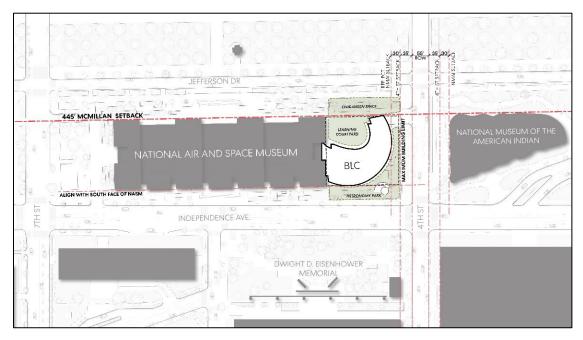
BLC setbacks from L'Enfant Plan streets, protecting viewsheds. (Perkins&Will, 2023)
